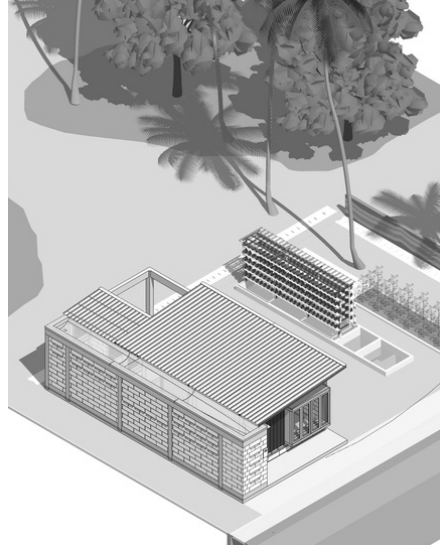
Structure with infill on ground floor [Urban Rural Systems, n.d.]
